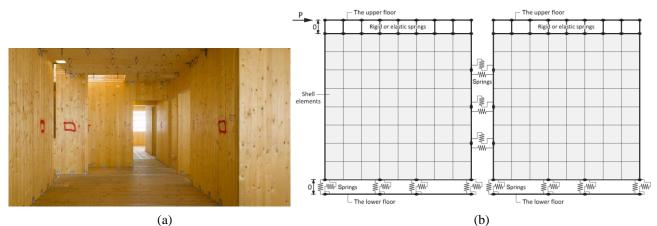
(a) Platform-type CLT building, Murray Grove (Courtesy of Waugh Thistleton Architects), and (b) FE models for coupled CLT shear walls.
